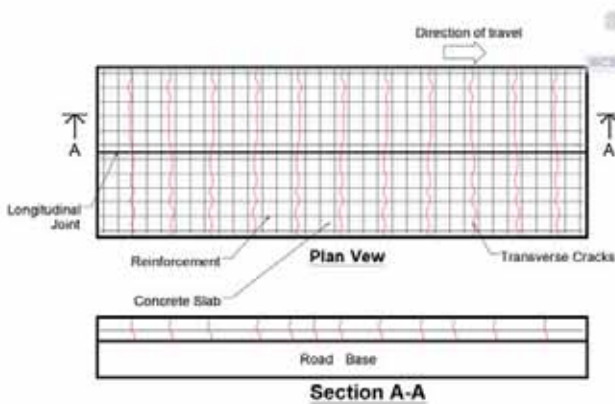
Continuously Reinforced Concrete Pavements(CRCP)
